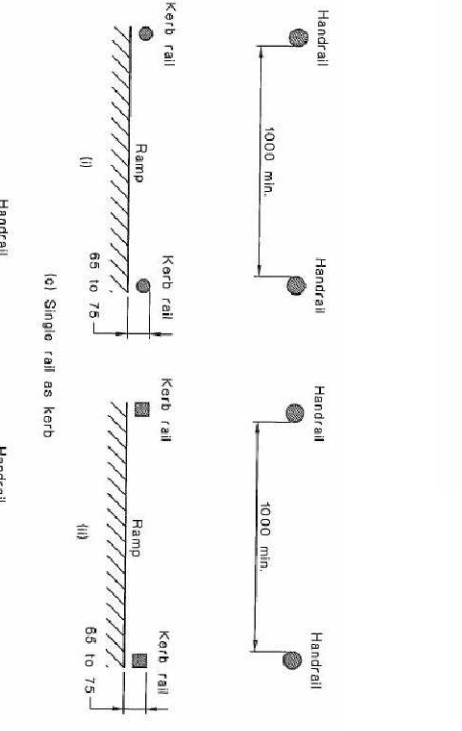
SECTION SHOWING LOCATION OF KERB OR KERB RAIL IN RELATION TO HANDRAIL WITH VERTICAL SUPPORT
